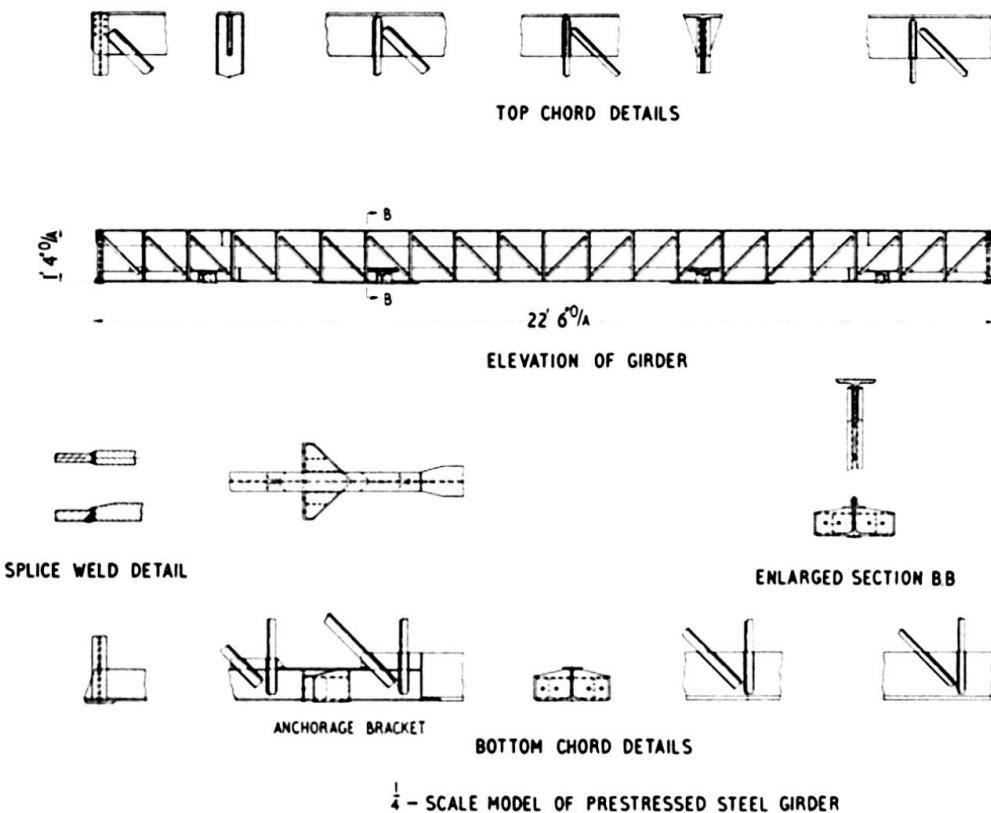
$\frac{1}{4}$ -scale model lattice girder.
